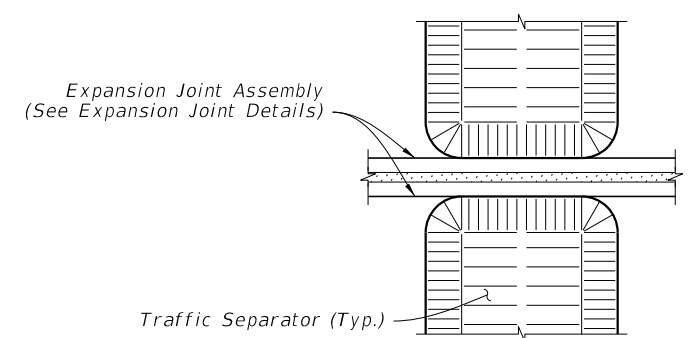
DETAIL AT Poured Joint With Backer Rod Expansion Joints
